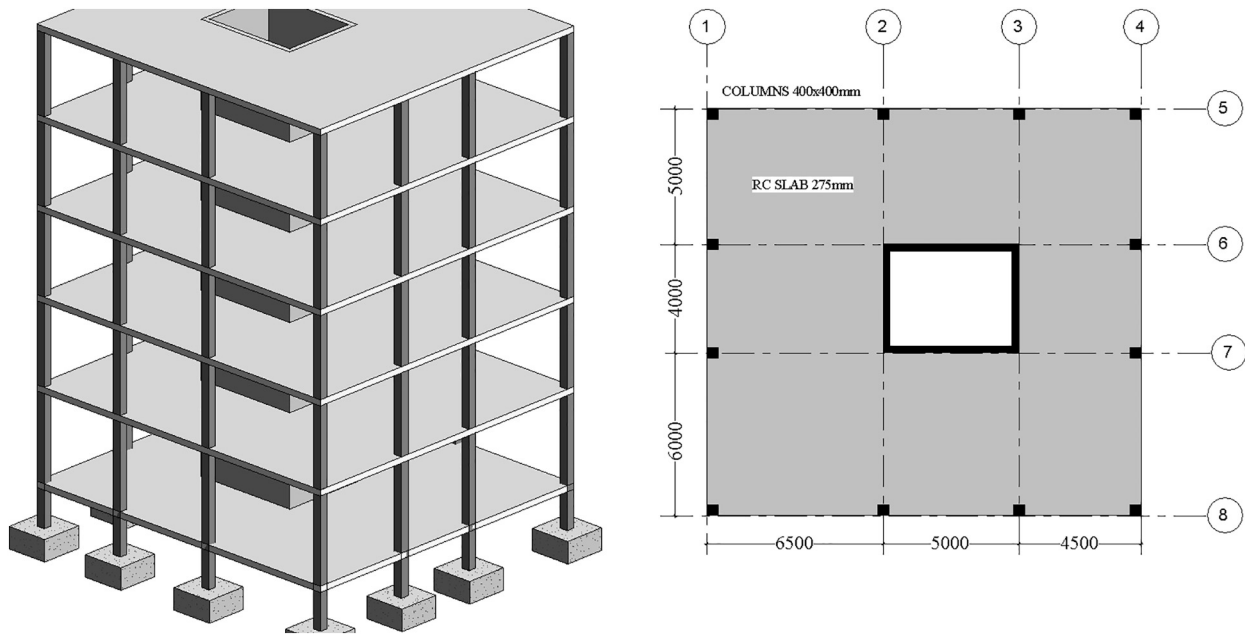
Structural BIM model and slab layout for the tested building scenario.
